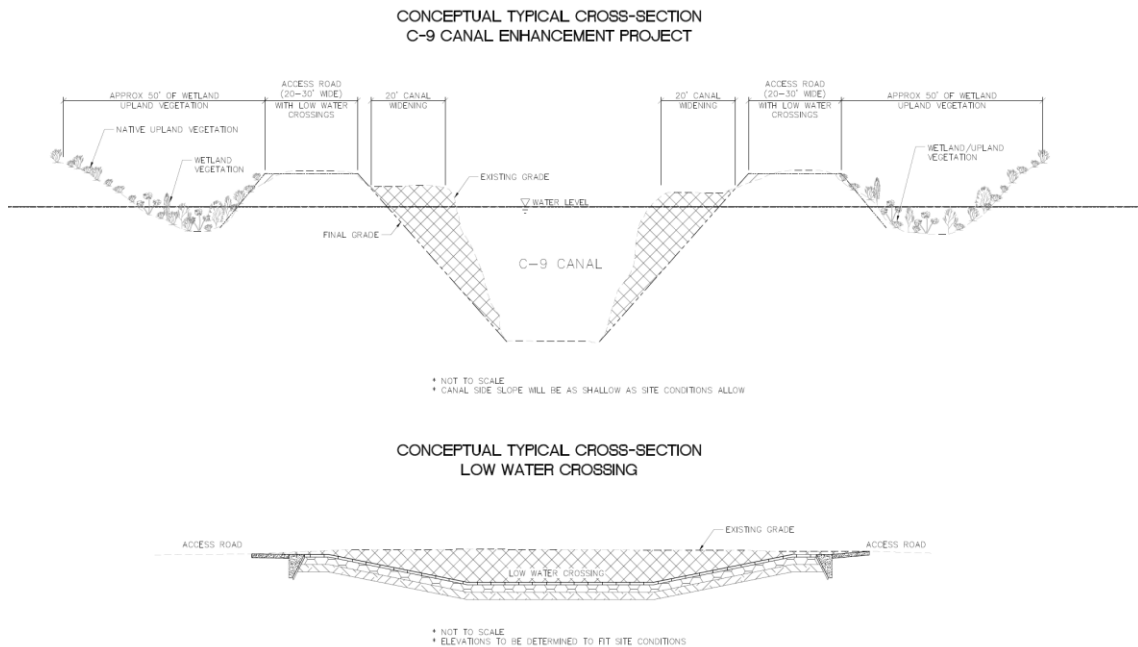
Typical cross-section of the C-9 Canal Enhancement project showing potential project features
